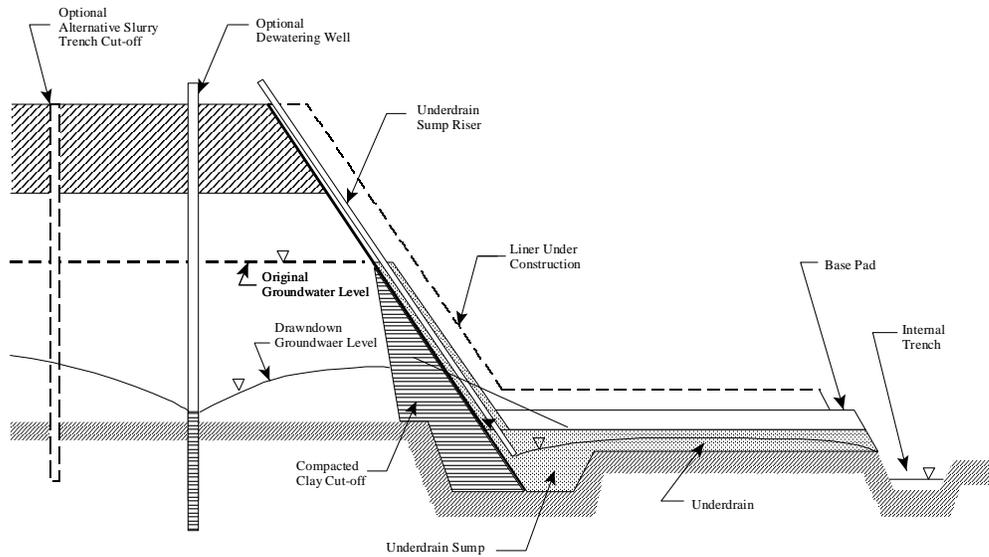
Dewatering Underdrain Detail with Cohesionless Sidewall and Cohesive Bottom
